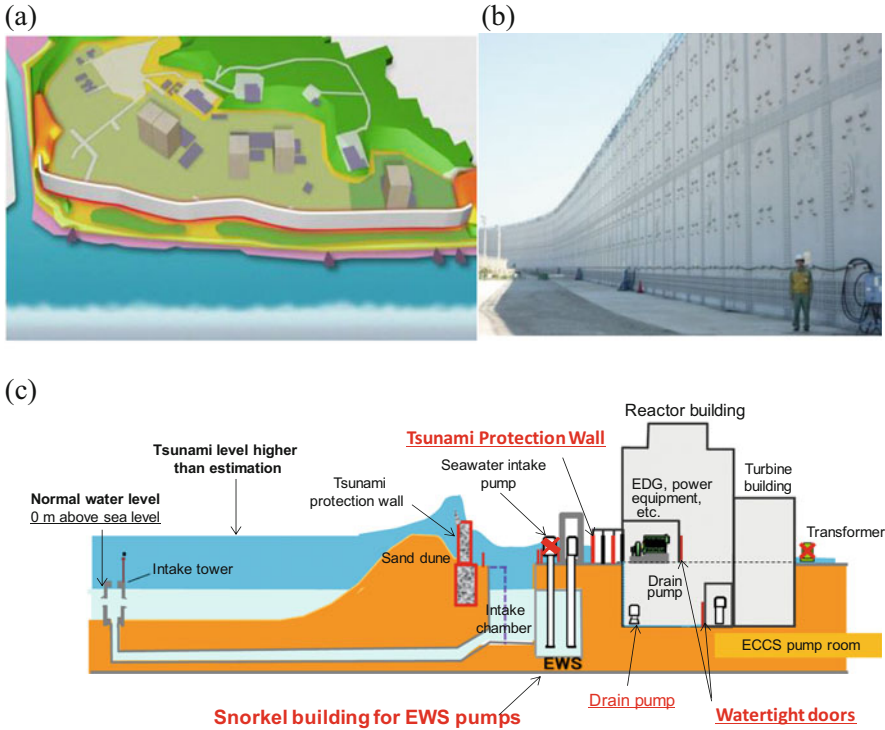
Tsunami protection measures at Hamaoka NPS (BWR) [14]. (a) Tsunami wall (22 m × 1.6 km). (b) Complete tsunami wall construction. (c) Cross sectional view of tsunami measures
